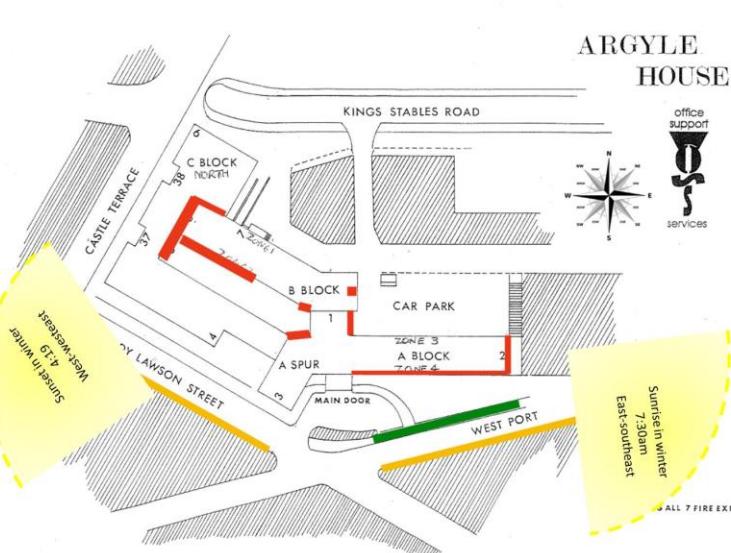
Site plan and mapping of the sun orientation and of the shadowed areas (green lines-shadows from trees, orange lines-shadows from buildings-red lines shadows from building design)
